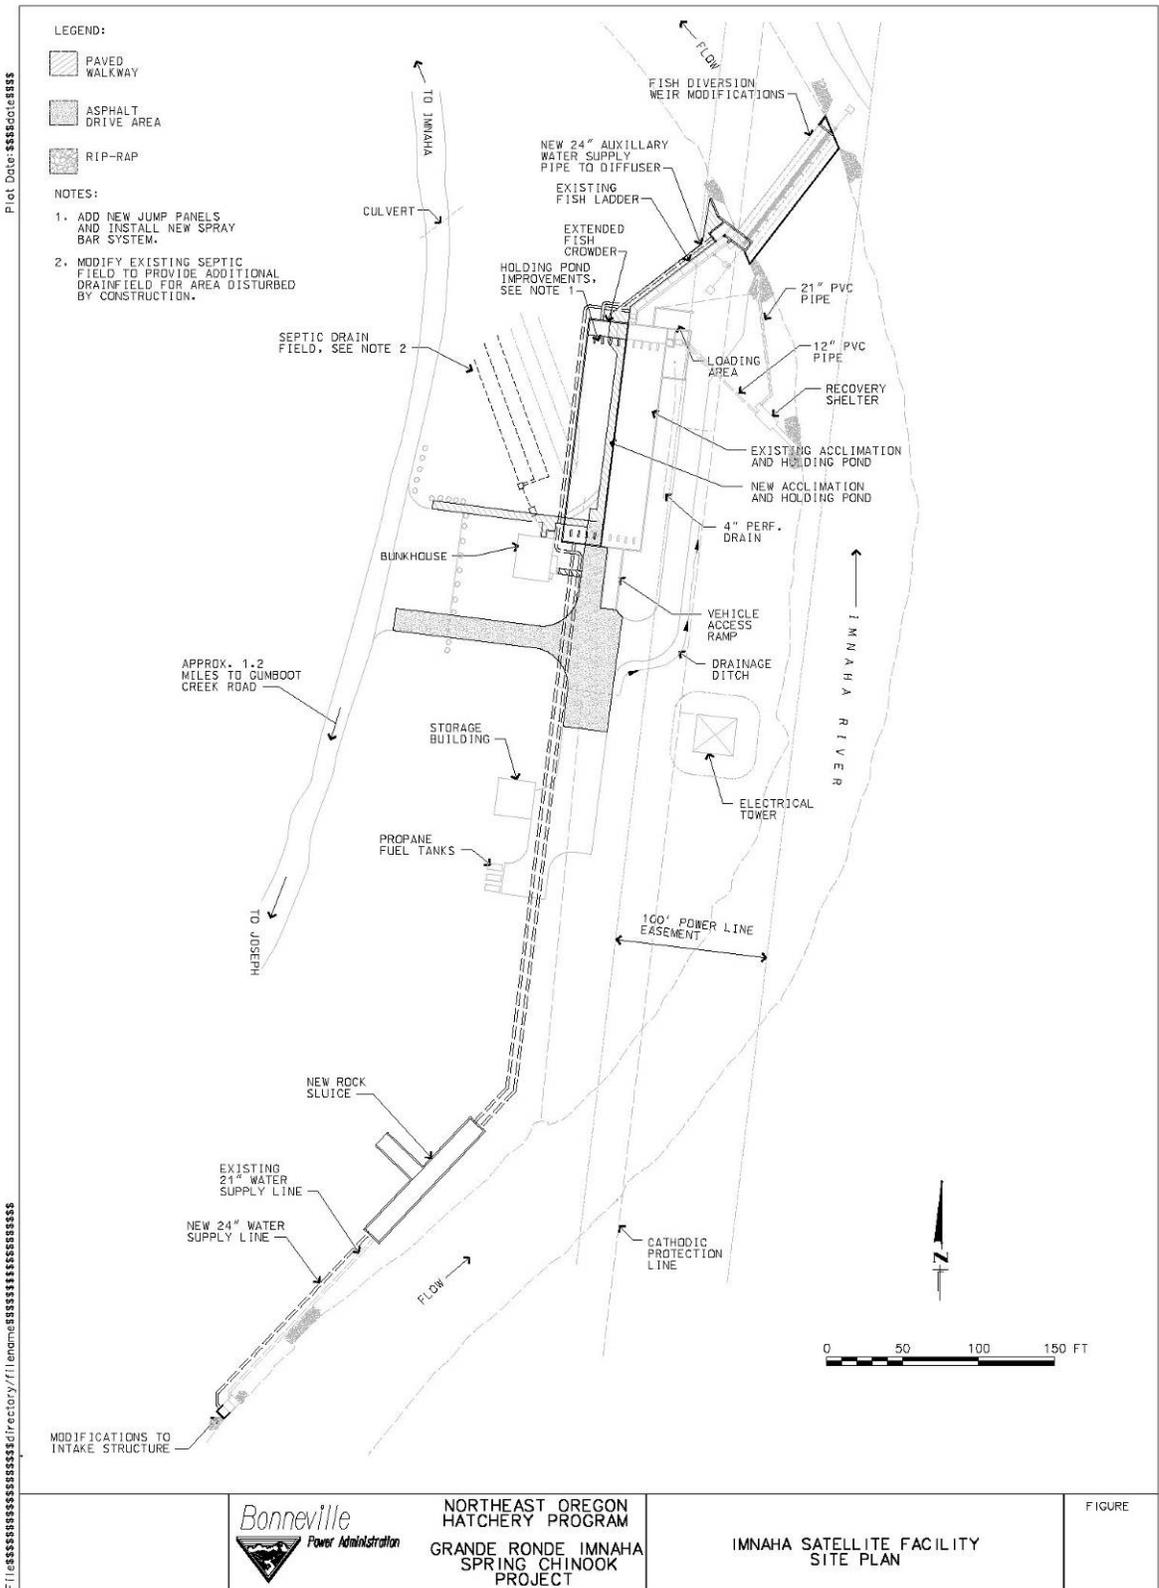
Imnaha Satellite Facility Existing and Proposed Site Plan as Presented in Original BA.
